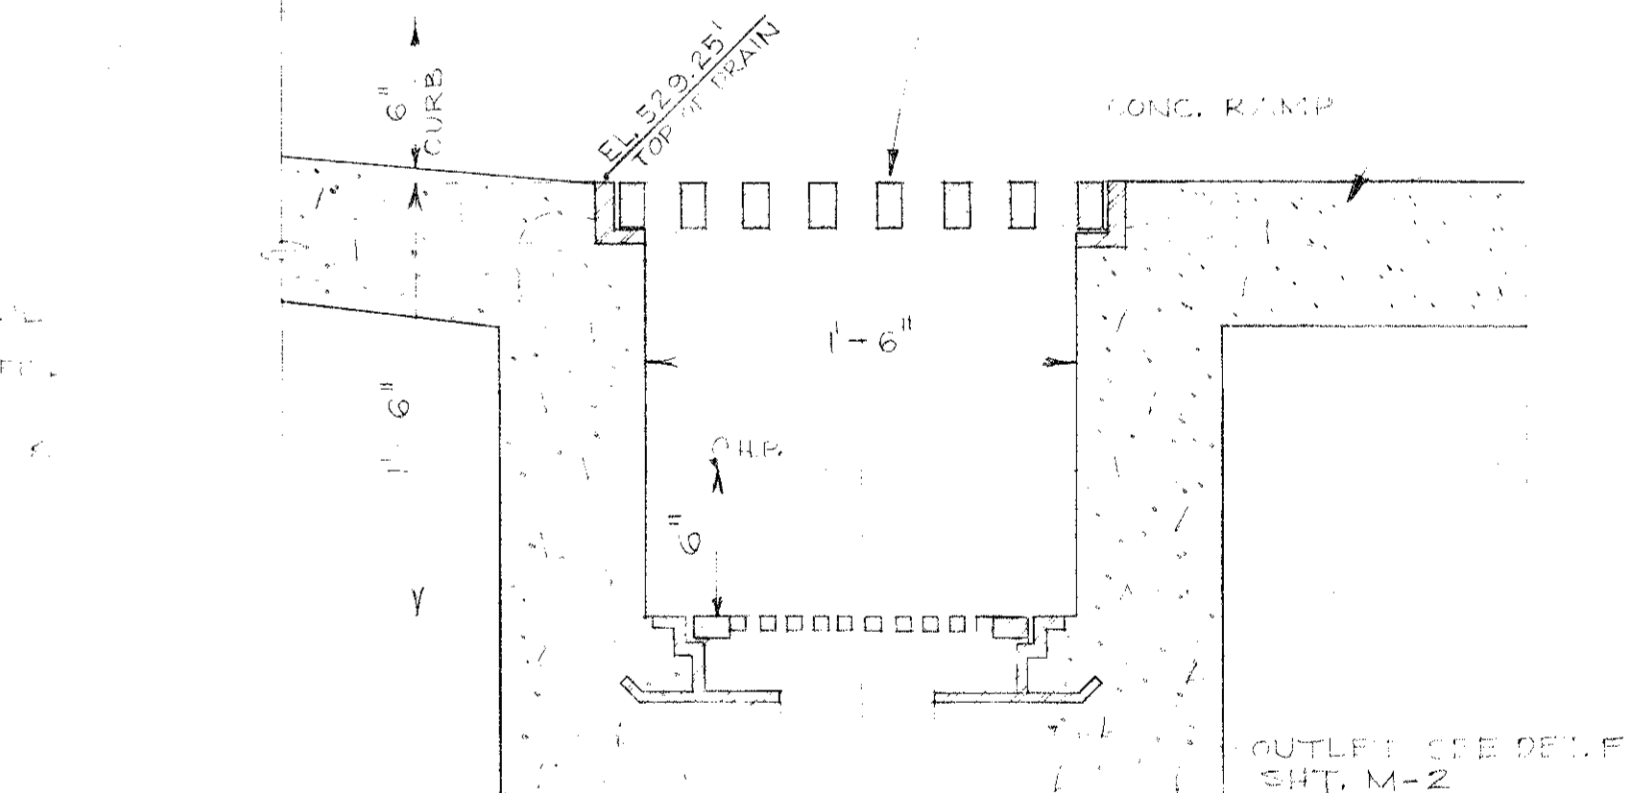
CURB SCALE: 1 1/2"=1'-0"
